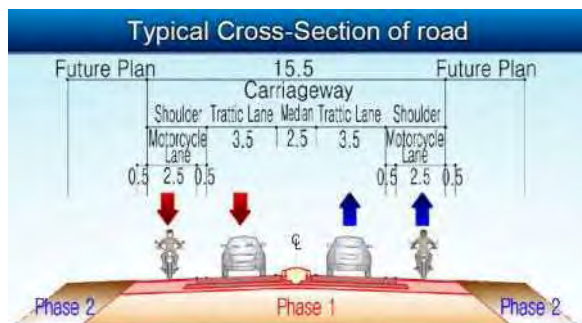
Typical Cross Section of Embankment of RR 3
